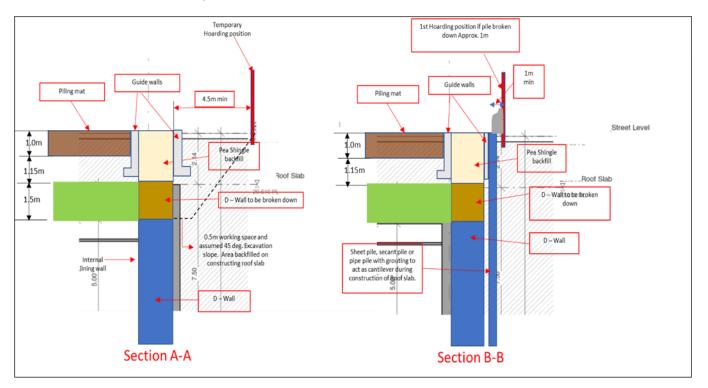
Top of Slab to Diaphragm Wall Construction Detail
